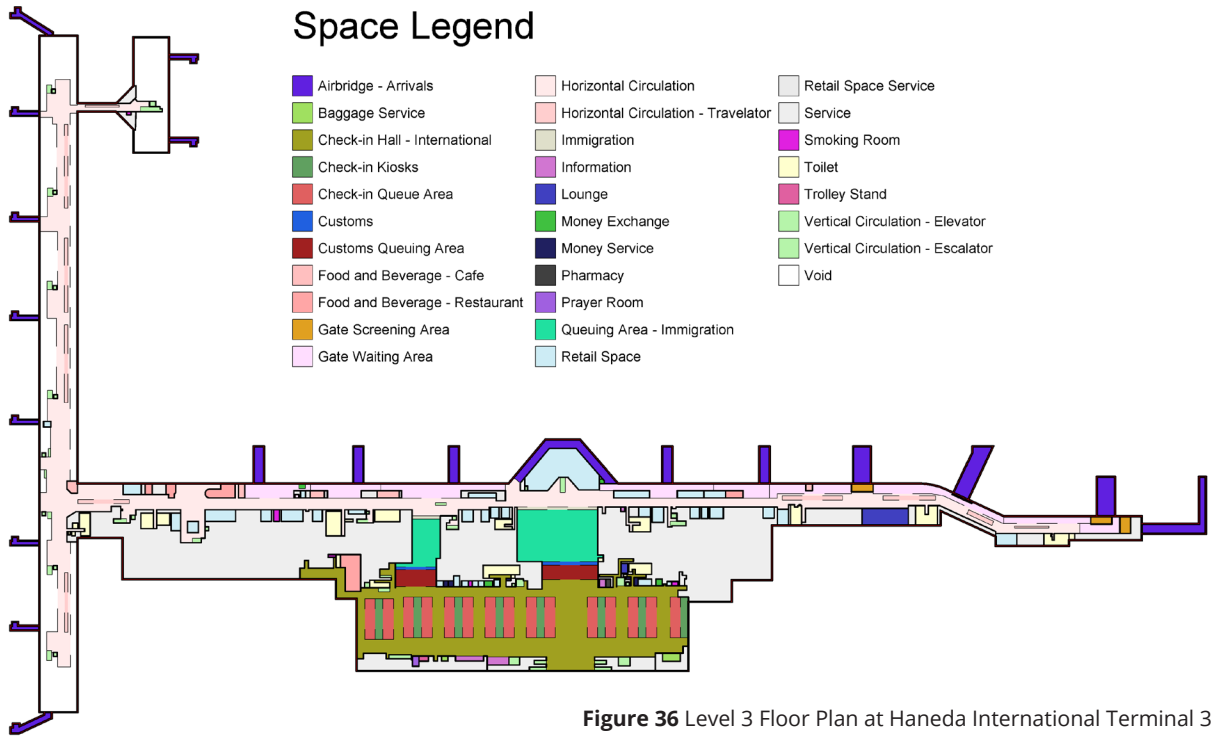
Level 3 Floor Plan at Haneda International Terminal 3
